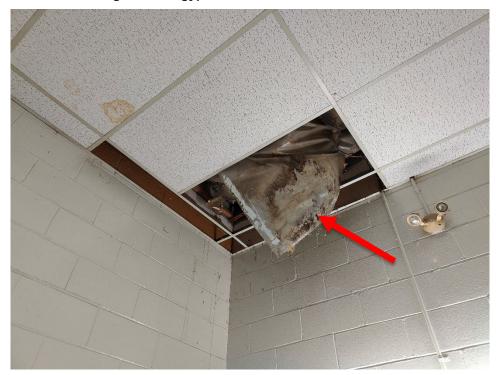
Mould growth on vapour barrier along with water-stained ceiling tiles.
